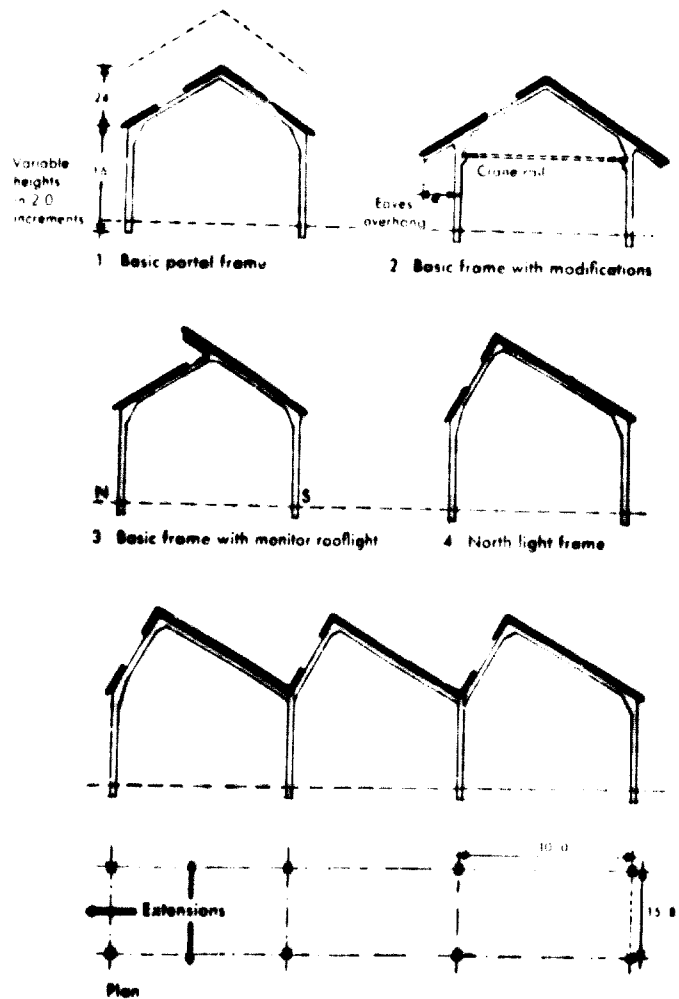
ALTERNATIVE SECTIONS FOR PORTAL FRAME TO MODULAR BAY
